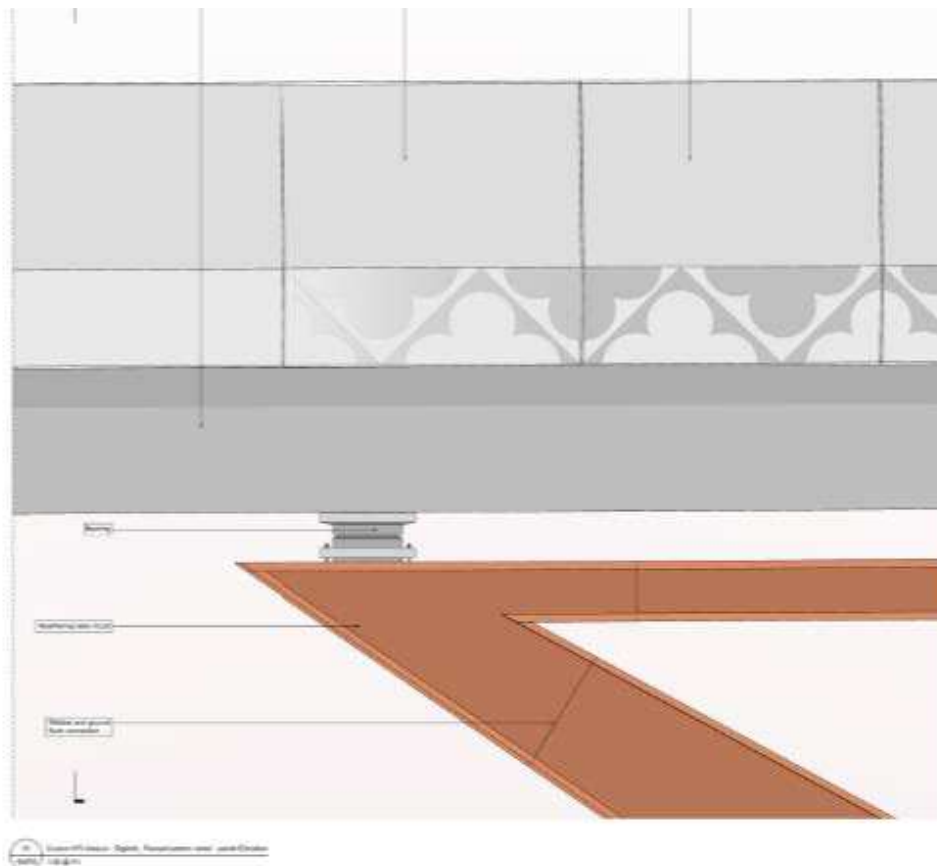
Drawing of the proposed etched motif details to the parapet as it over sails the canal.
